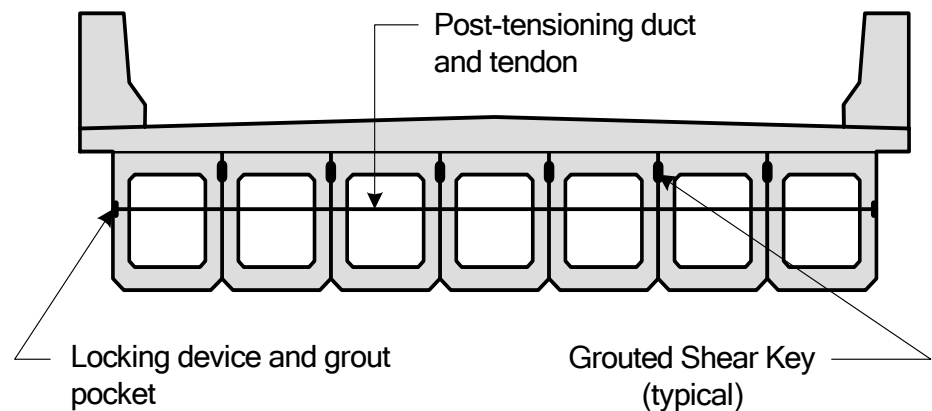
Transverse Post-tensioning of an Adjacent Box Beam Bridge
